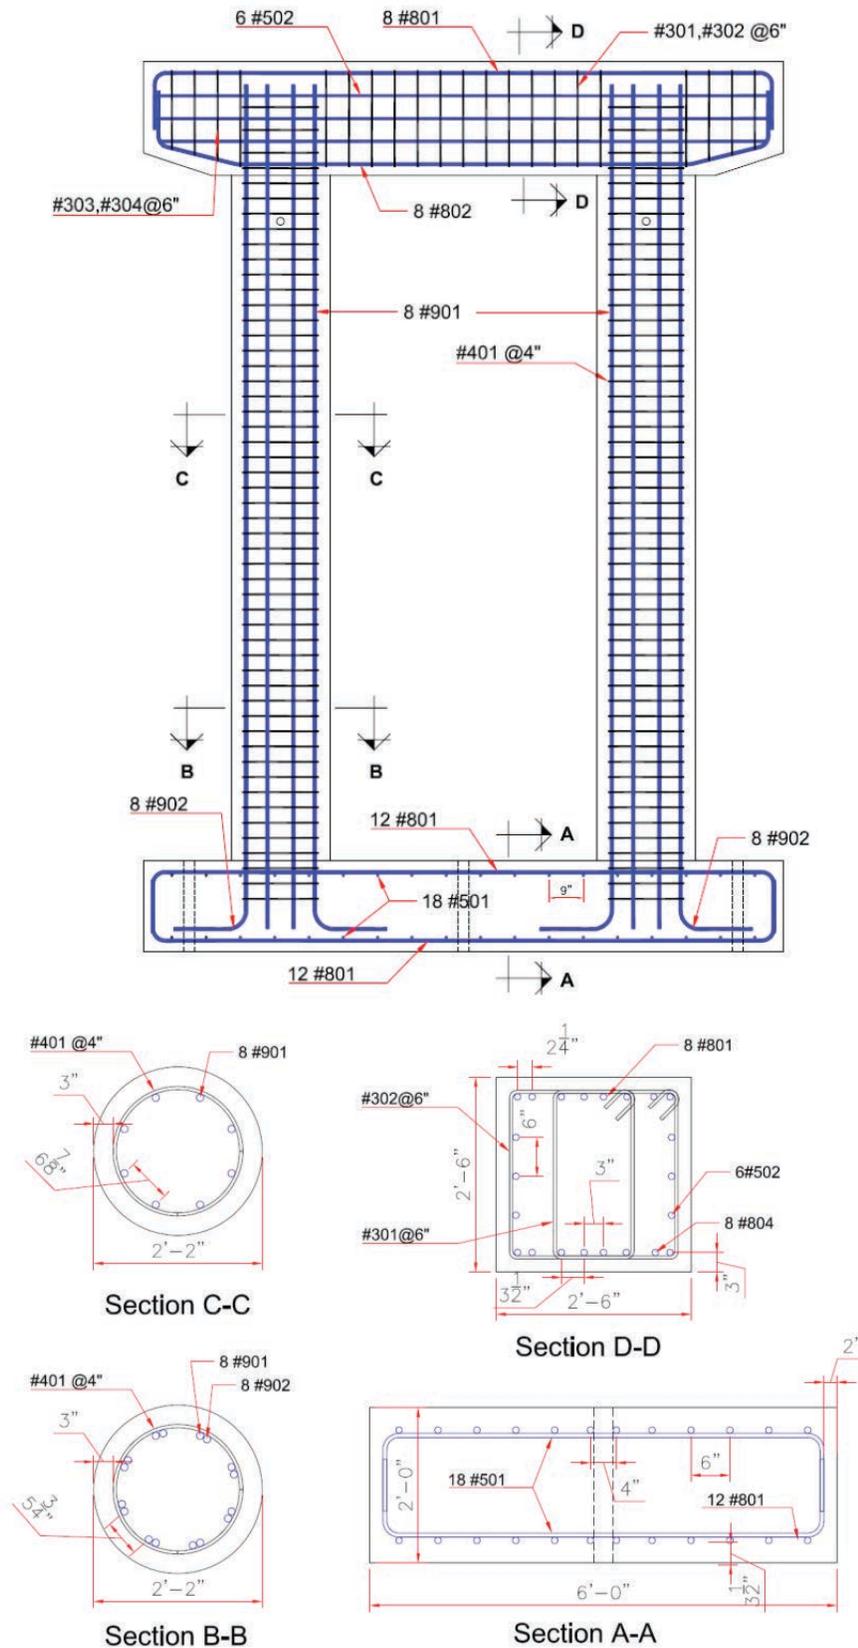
Reinforcement details and cross sections of the bridge pier specimen.
